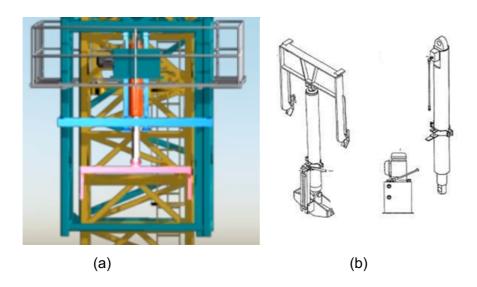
(a) Telescopic cage installed to the mast; (b) Hydraulic system: 1. Equipped Telescoping Yoke, 2. Hydraulic Cylinder, 3. Hydraulic Unit, 4. Cylinder Support Beam, 5. Cylinder Stop, 6. Lever
